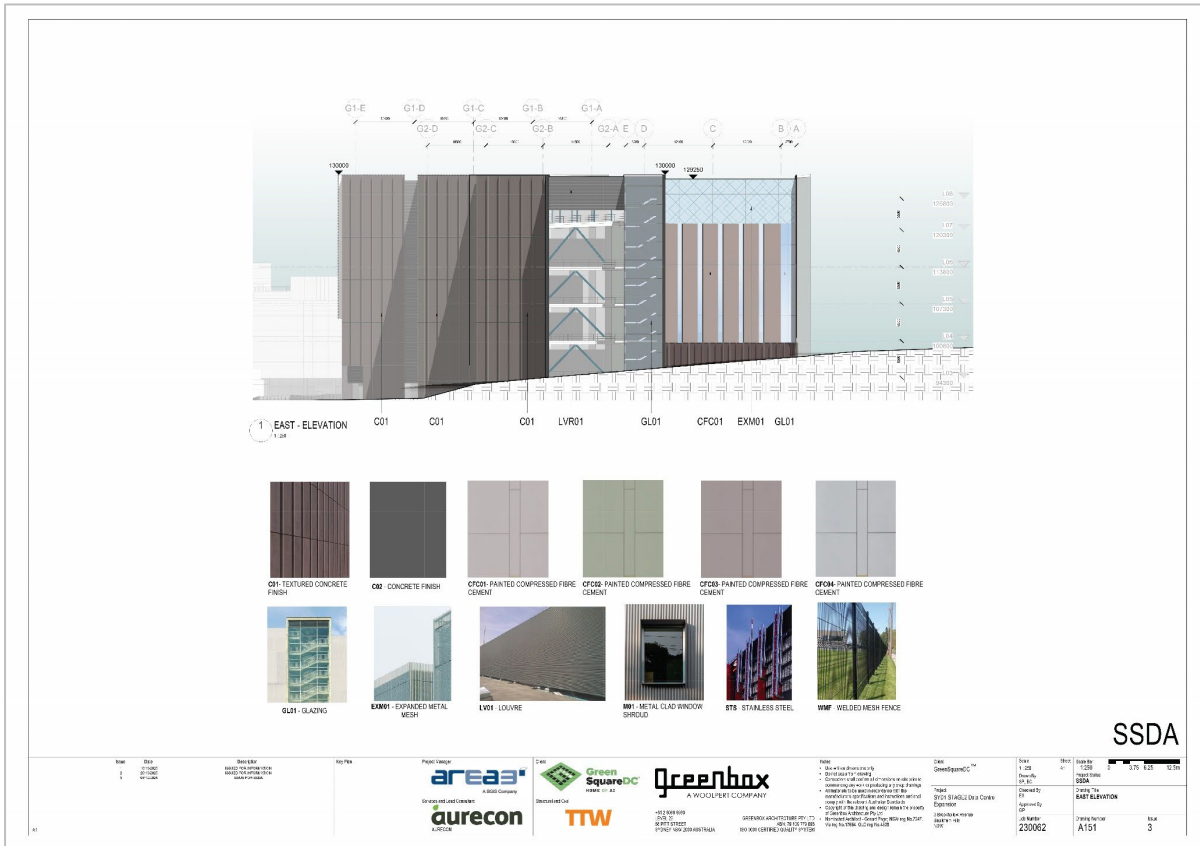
Eastern Elevation (Source: Greenbox. 2025).
